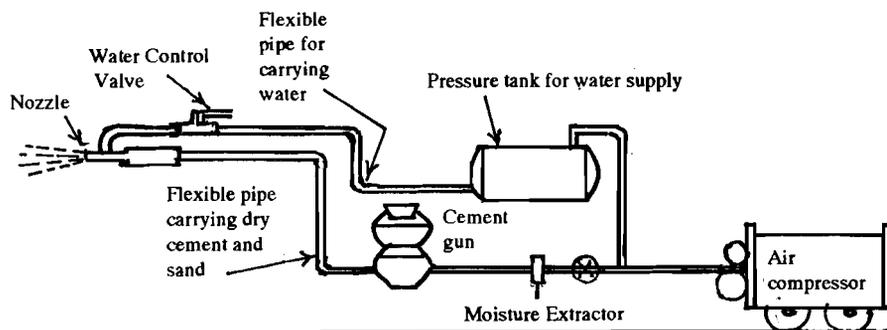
A Typical Plant Layout of Guniting Equipment
